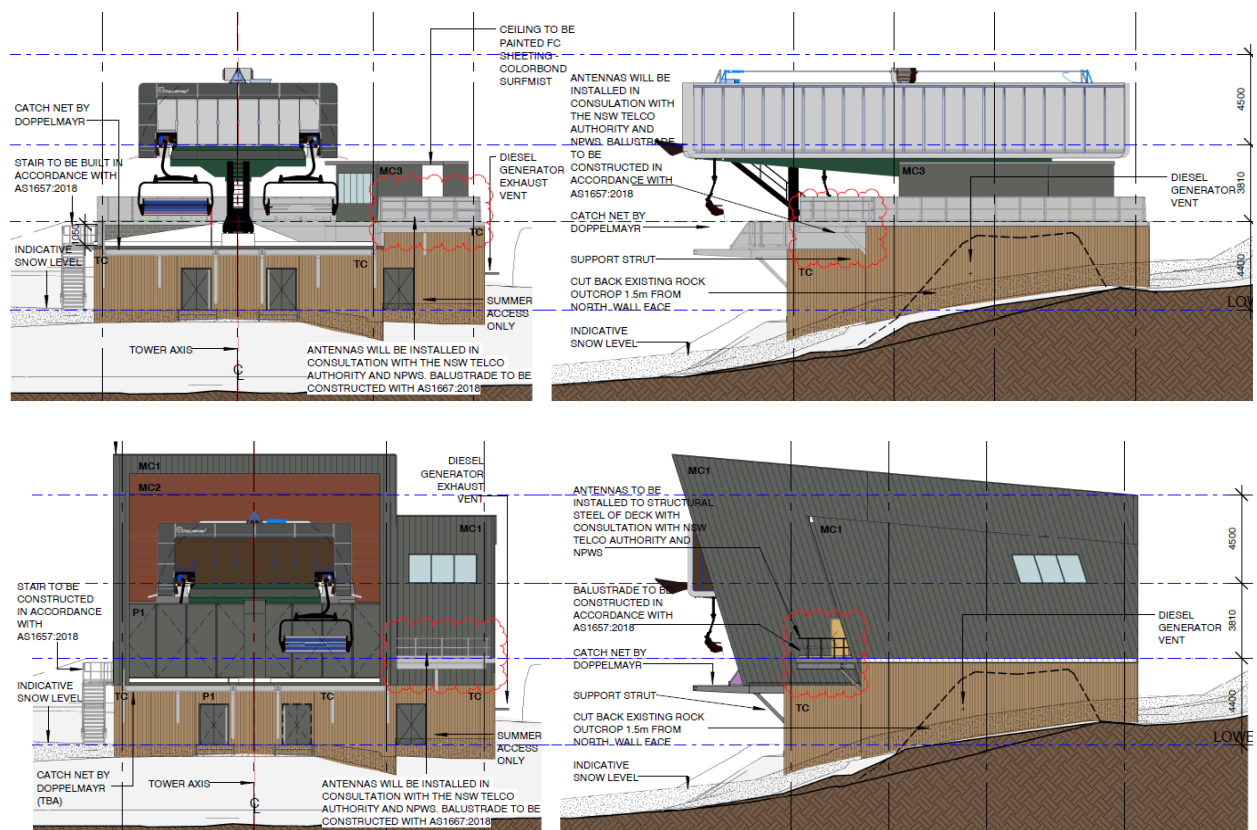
| Elevation view of top station, with proposed Stage 1 (top without enclosure) and Stage 2 works illustrated (Source: Applicant's documentation)
